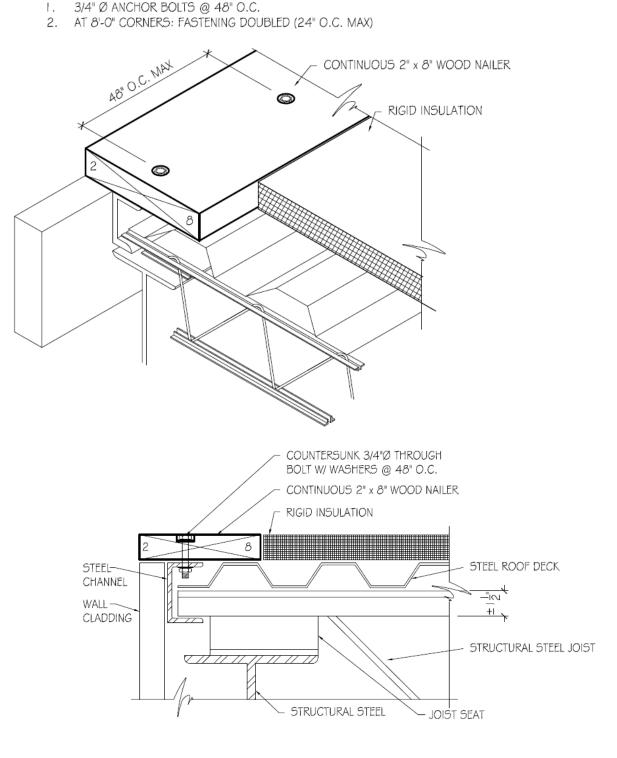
ROOF EDGE WOOD BLOCKING - THROUGH BOLT ANCHORS
